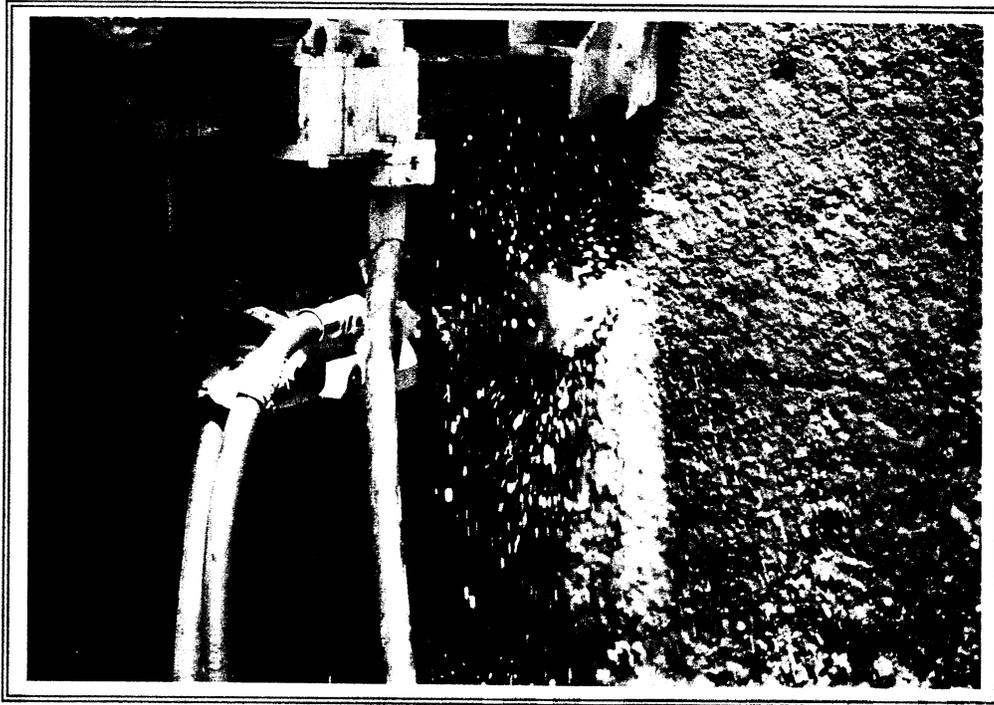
Concrete coring equipment secured to the Pier in the process of taking a core sample.
